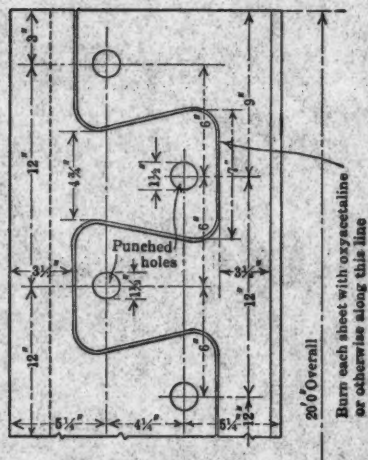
### DETAIL OF CONCRETE INTERLOCKING SHEET-PILES
